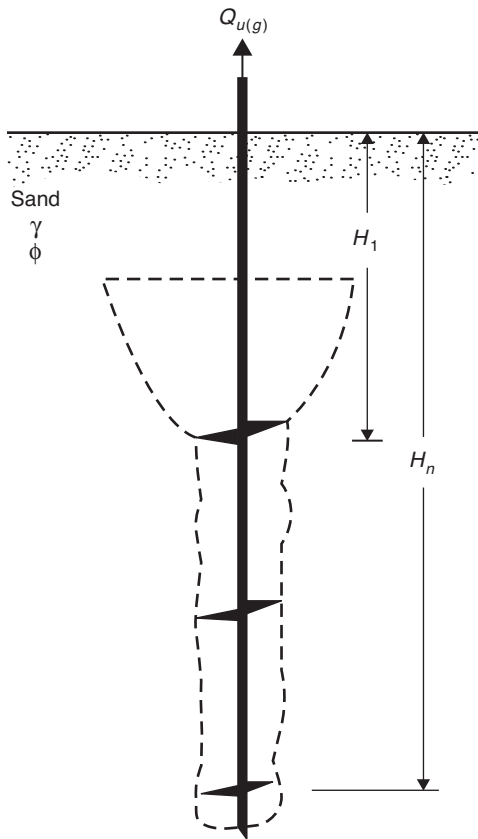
Typical failure pattern in sand around a multi-helix anchor for shallow anchor condition
